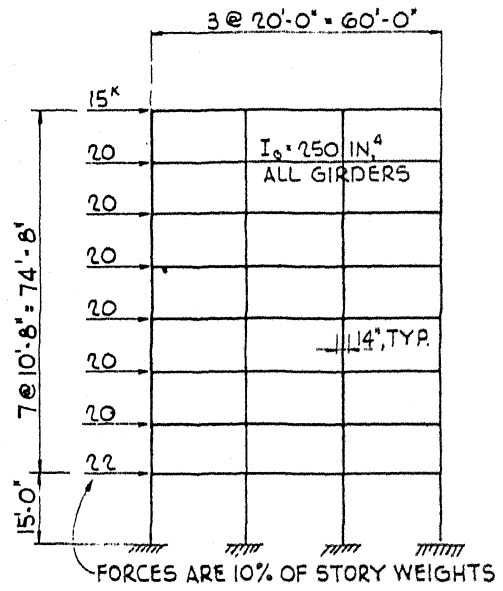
PARTIAL ELEVATIONS OF BUILDINGS
